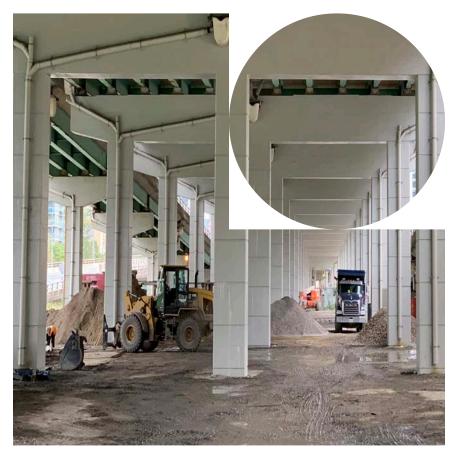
View looking east of the Spadina Island site; note the construction materials and maintenance equipment.
